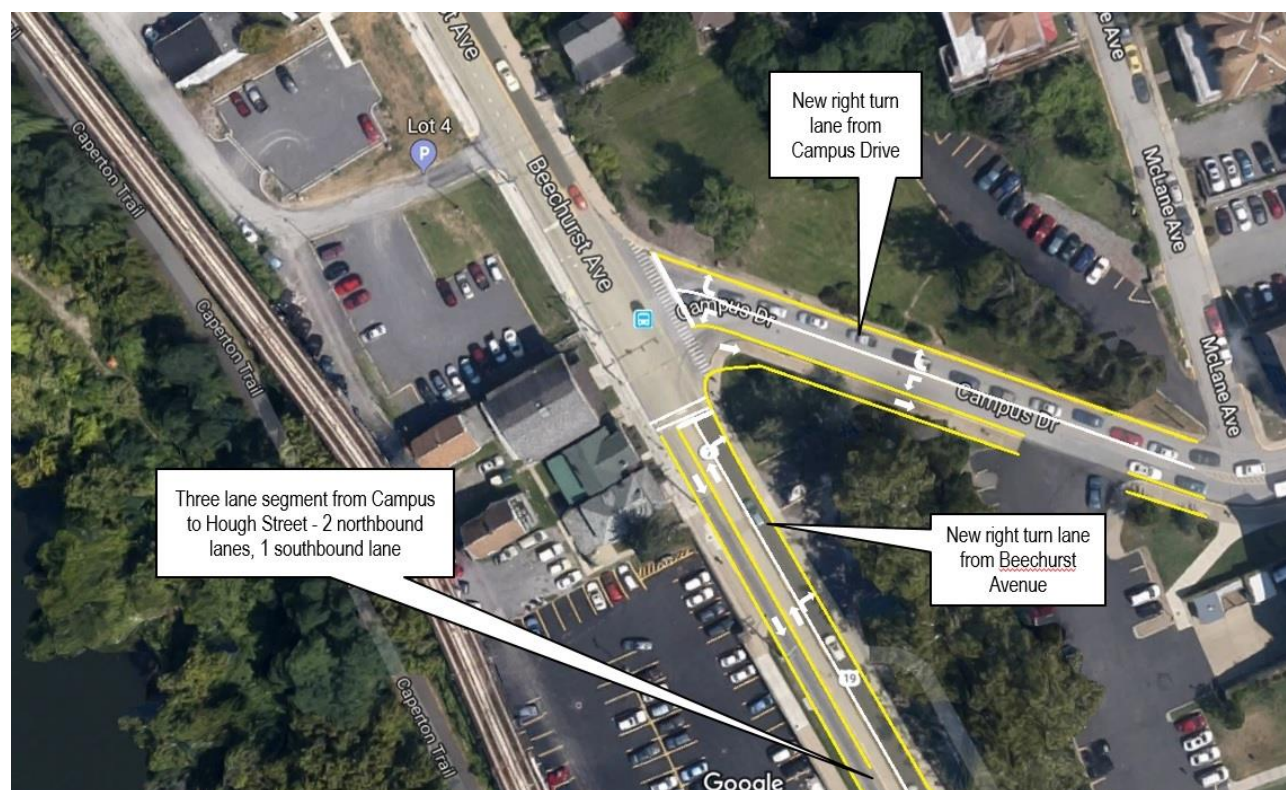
Intersection Improvements Only - 3 Lanes on Beechurst between Campus Drive and Hough Street
